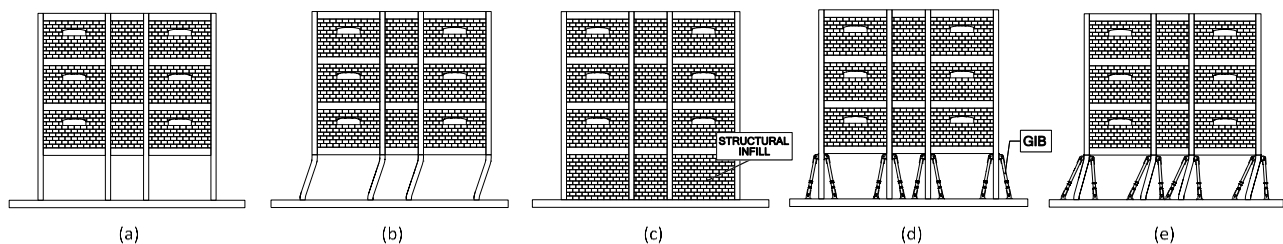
a) soft first story buildings, b) typical seismic damage to soft story buildings, c) common retrofit strategies , d) proposed GIB system) , e) response of the retrofitted building using GIB system during earthquake
